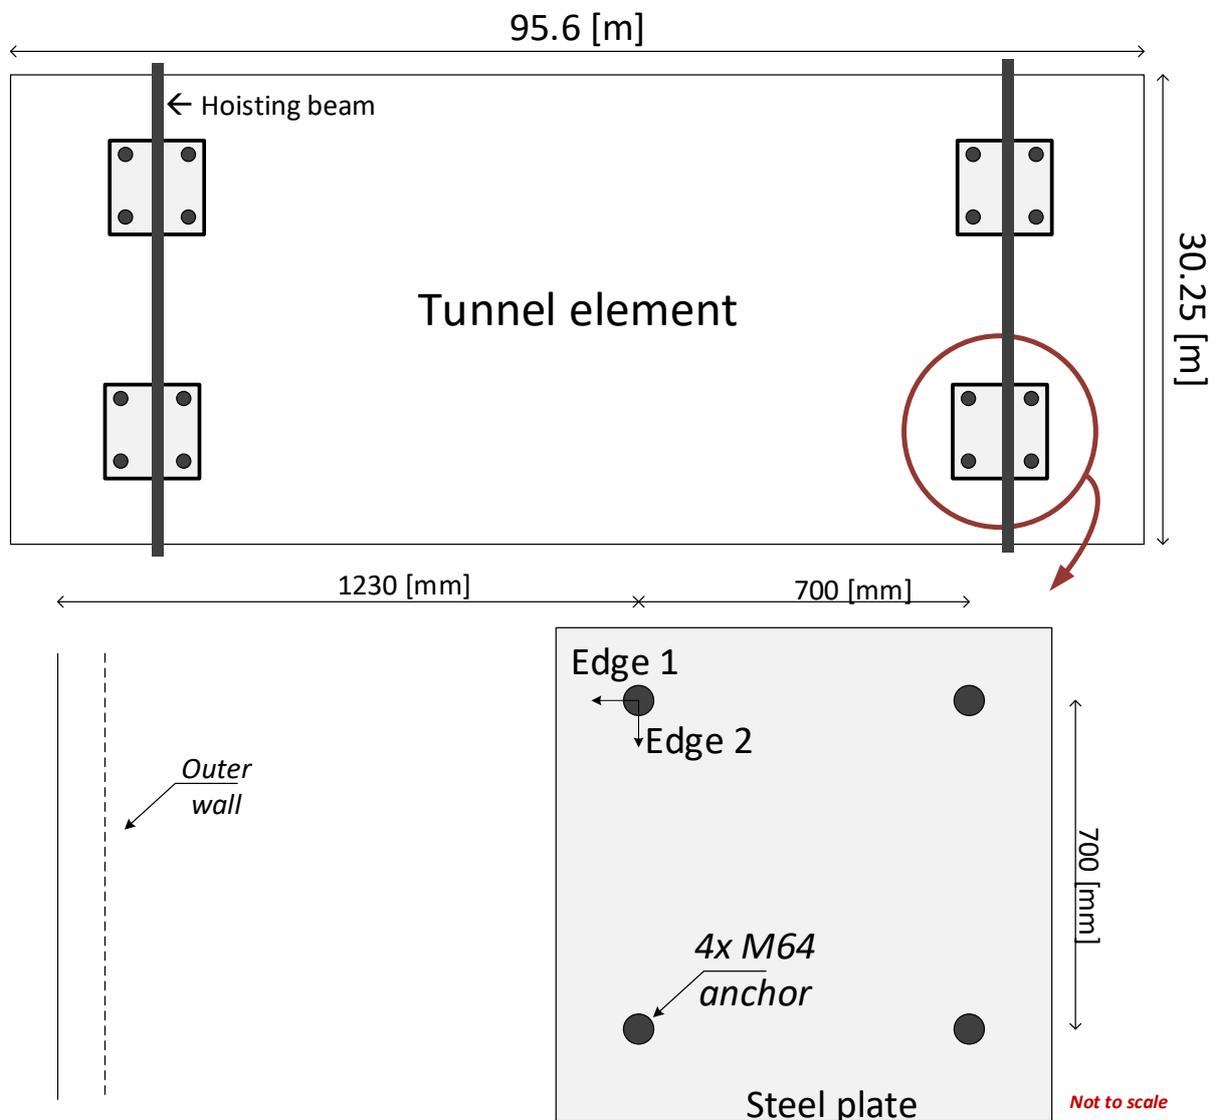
, ANCHOR LAYOUT TUNNEL ROOF; TOP VIEW
